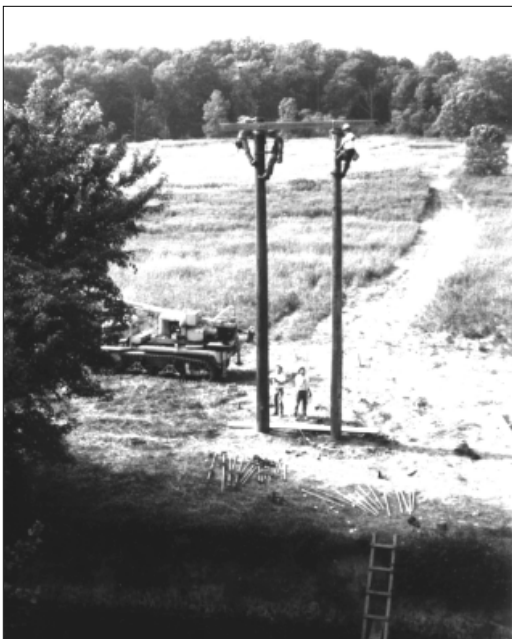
GPU Energy volunteers installing the tower cross-bracing on the west tower. *Photo Courtesy of Mr. Paul DeCoste.
